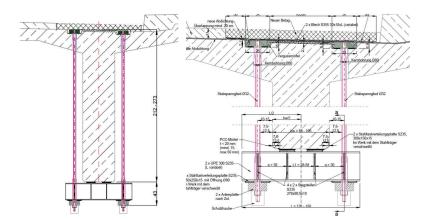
Example of external shear strengthening of a bridge girder with pt bars.
